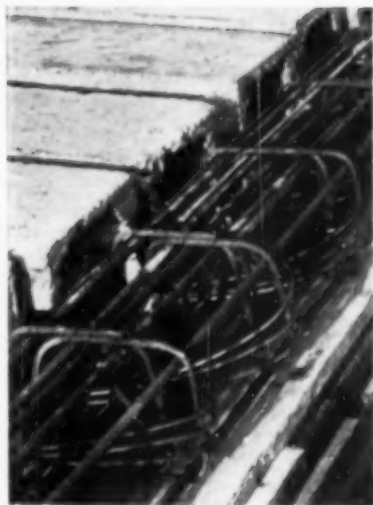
Cables anchored to Reinforcement of Edge Beam.
